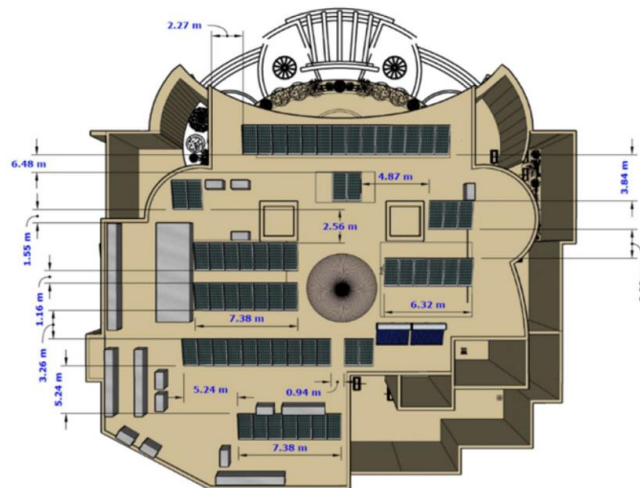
Case study House Roof Plan, provided by Solar Land Company
